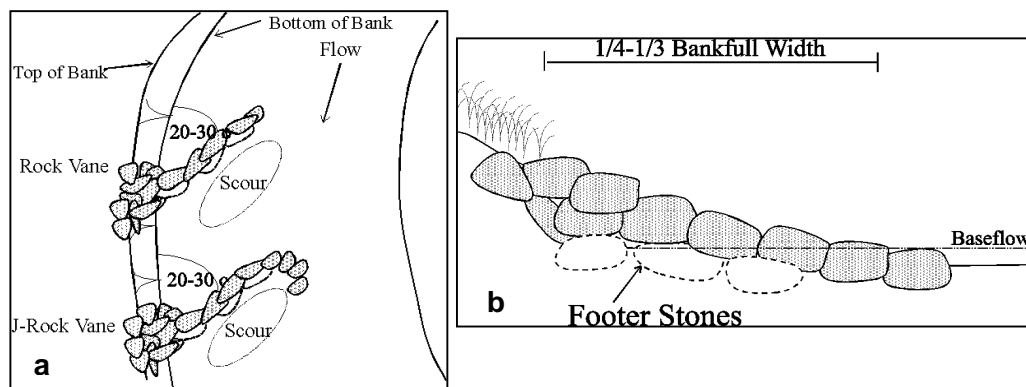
Plan view of rock vanes (a); Cross-section view of a rock vane (b)
